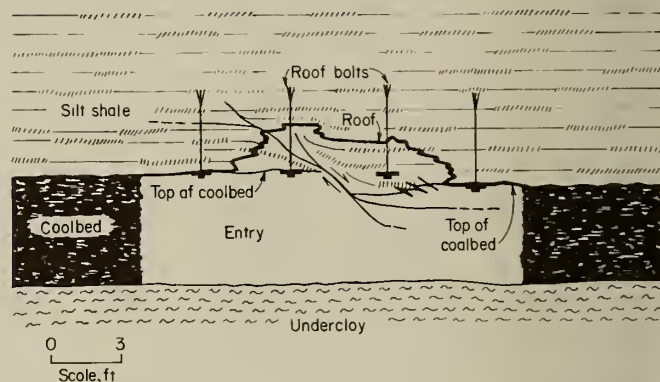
Subtype G_4 roof failure attributed to faults.
